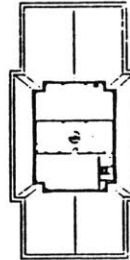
PLAN SEVENTH FLOOR OF MAIN BUILDING
